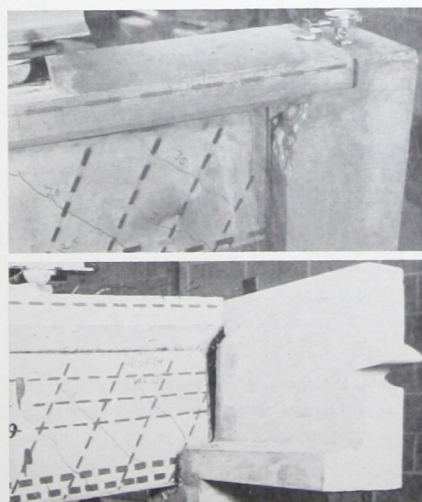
Girder-column connection after test. Top—Girder 1; bottom—Girder 2
